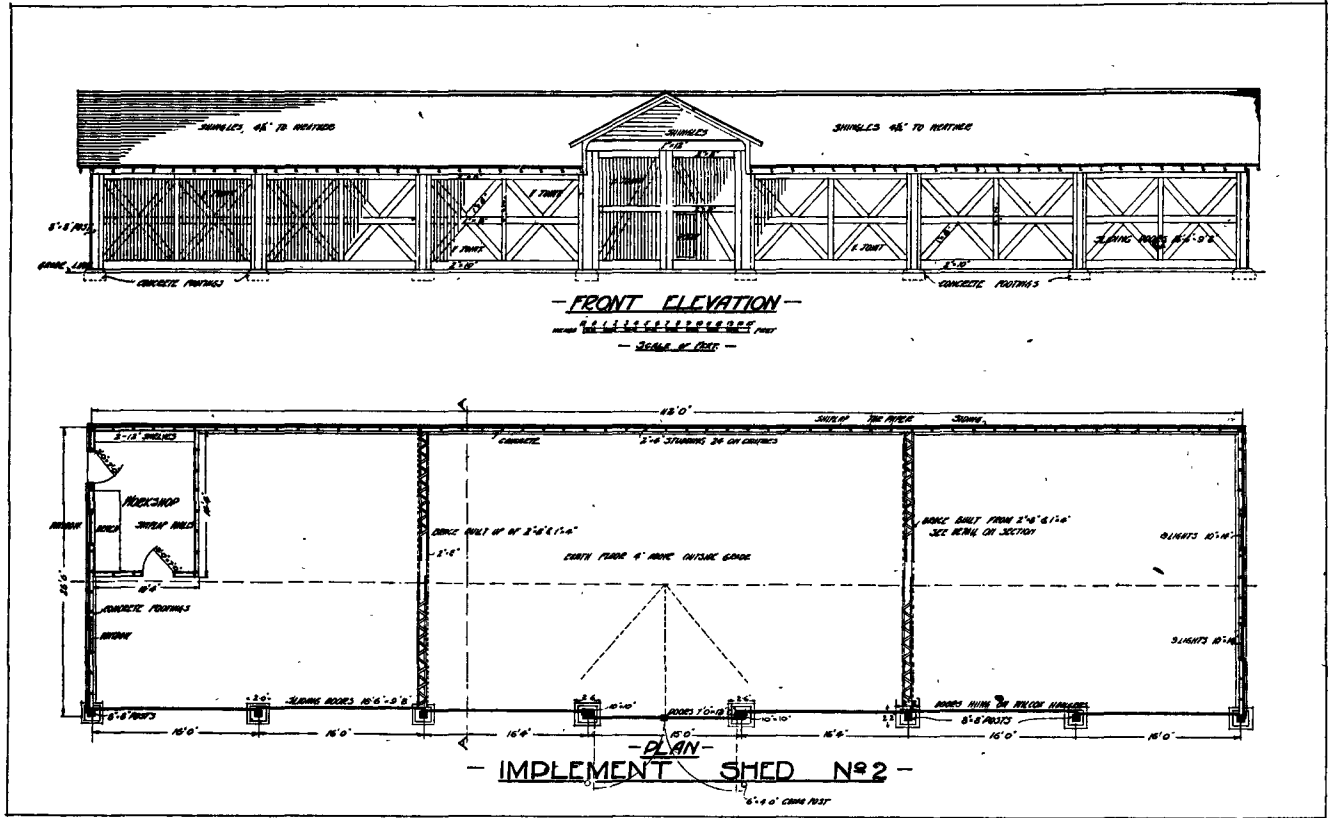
A bigger shed, 112 ft. long and 28 ft. wide, suitable for a large grain farm. The middle doors are 12 feet high to take an engine and separator. Two binders or four drills can be stored in a row across the building.
